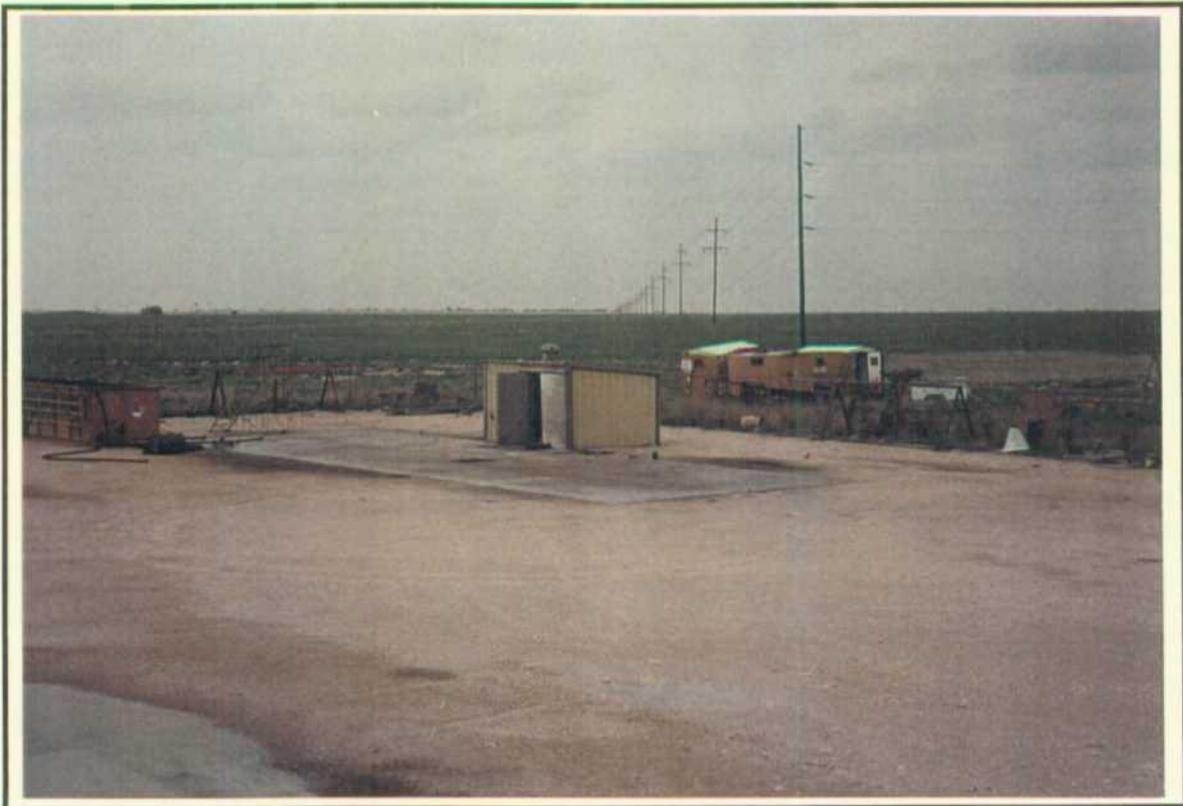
Northeast wash pad/seepage pit prior to restoration/assessment activities.
